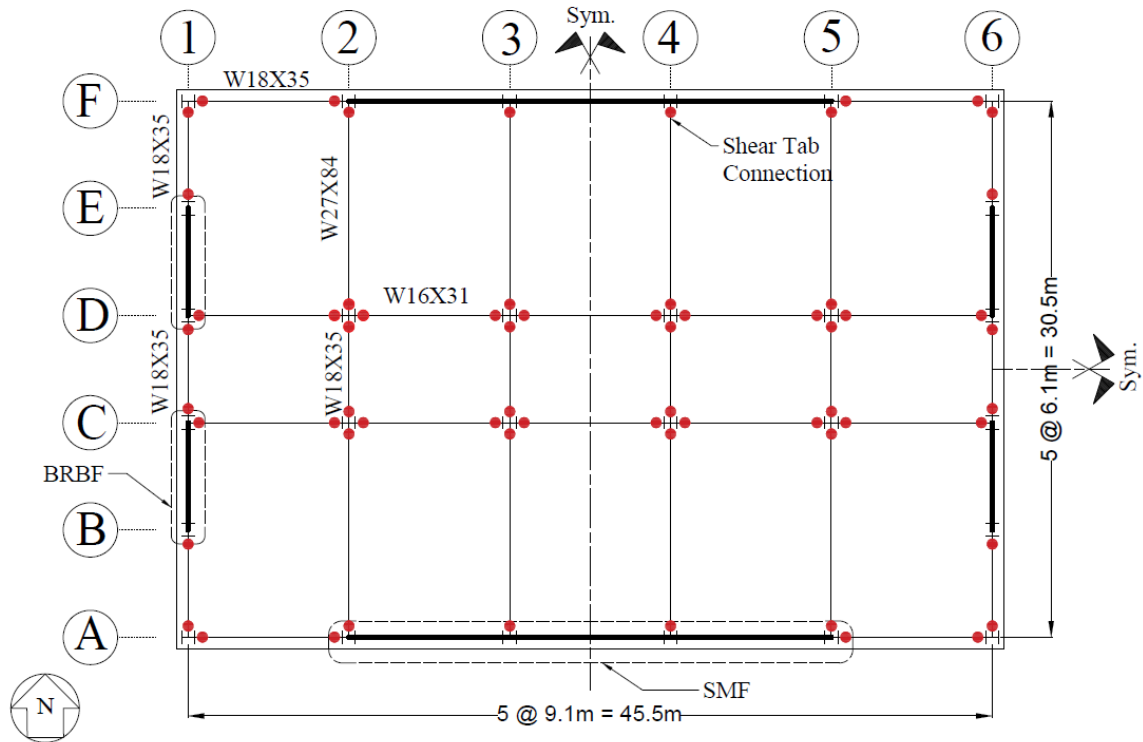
Typical Floor Framing Plan for 4- and 8-story Buildings
